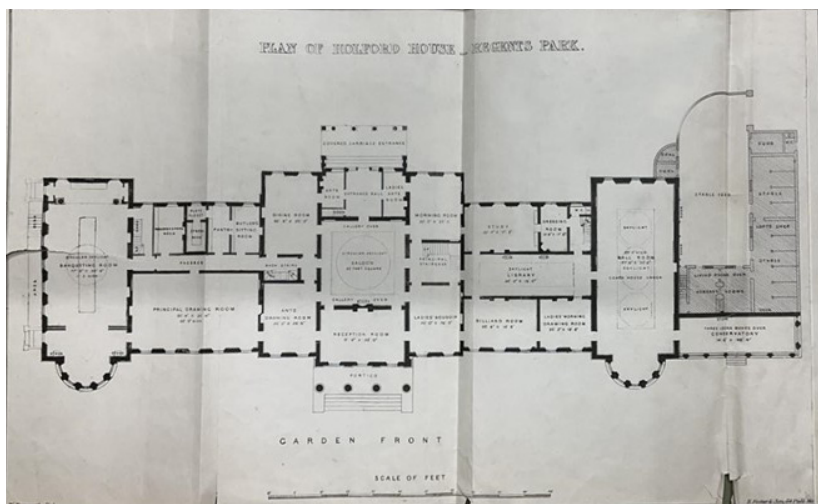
W.Papworth's drawing of the extended ground floor plan, Crown Estate Records (file Work 16/1191, 1932.) Courtesy TNA
